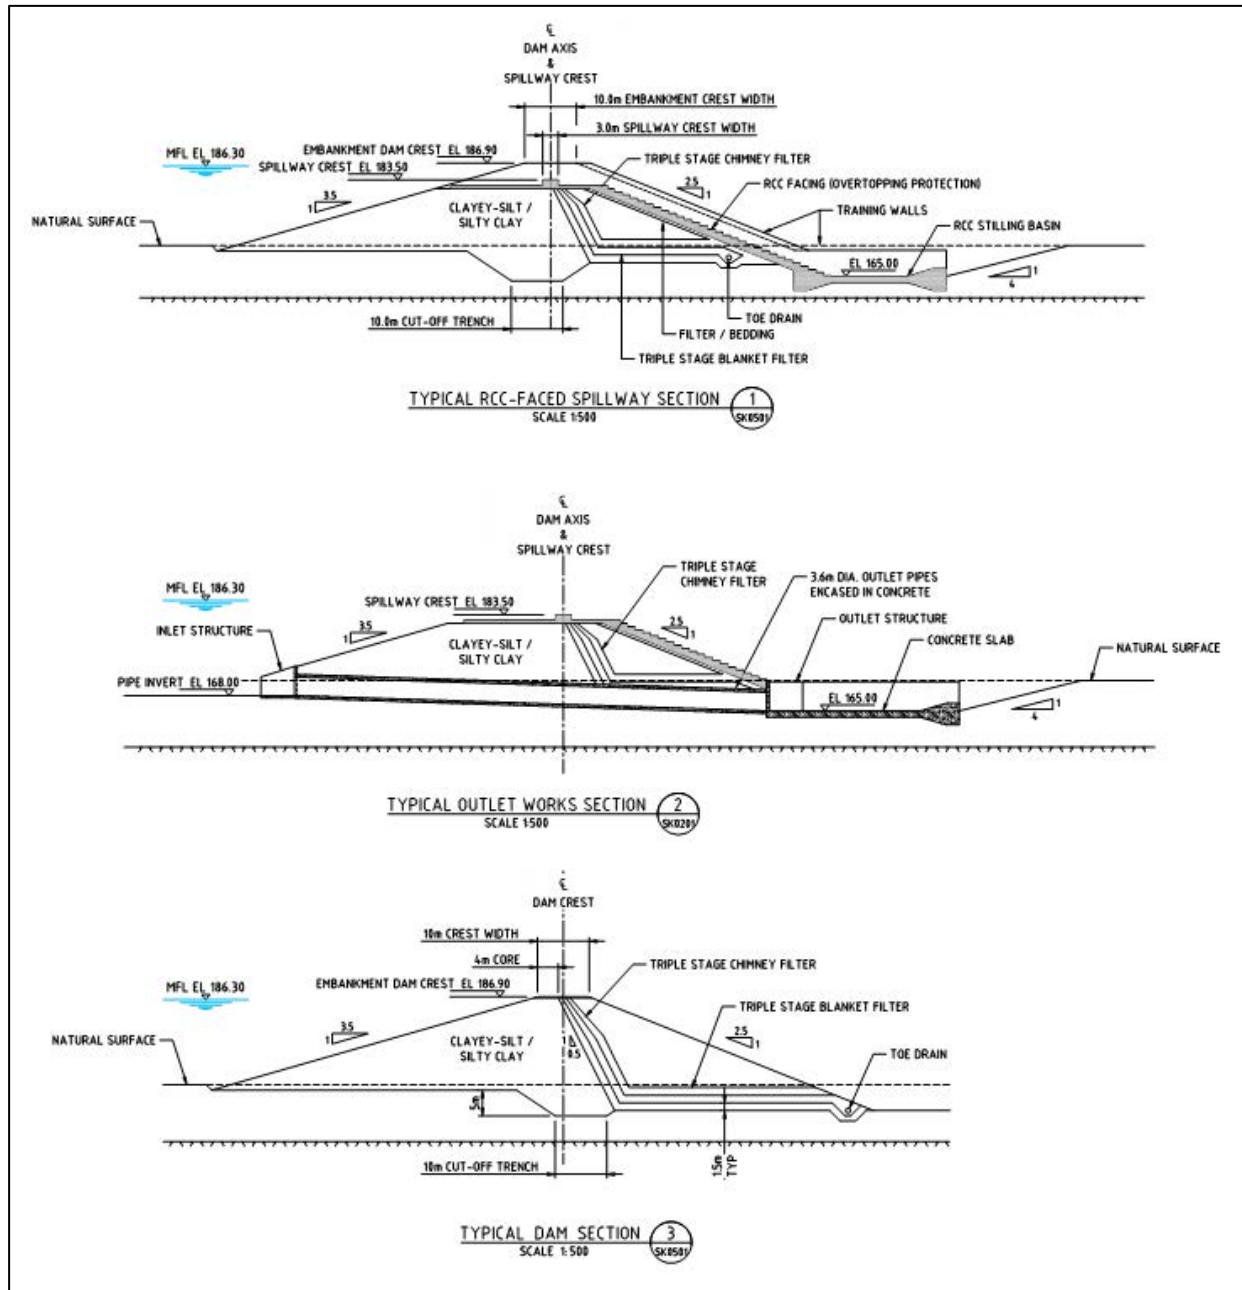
Typical cross sections of potential flood mitigation dam - Laidley Creek AMTD 41 km
